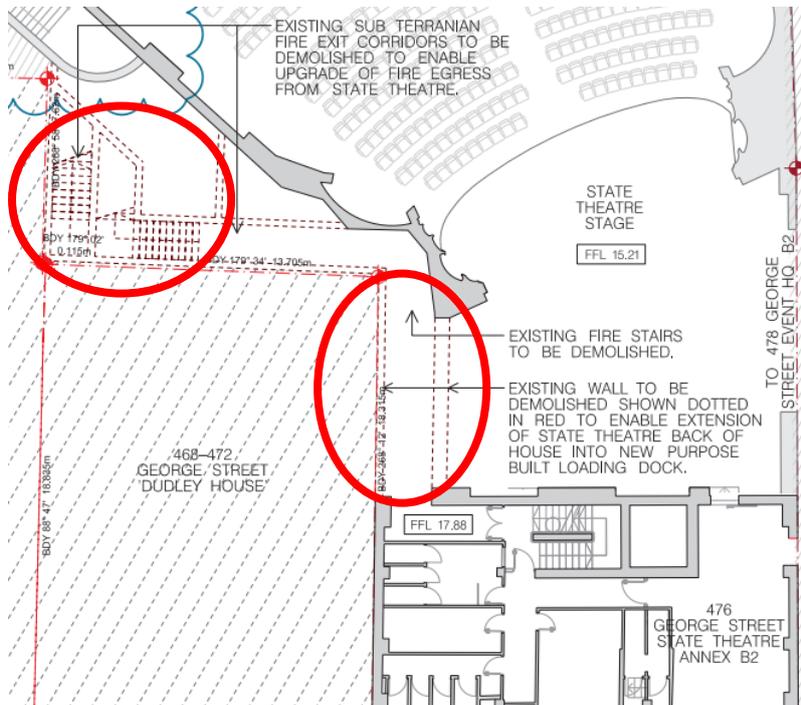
Extract from the basement demolition plan drawing, indicating walls and fire stairs to be demolished circled in red
